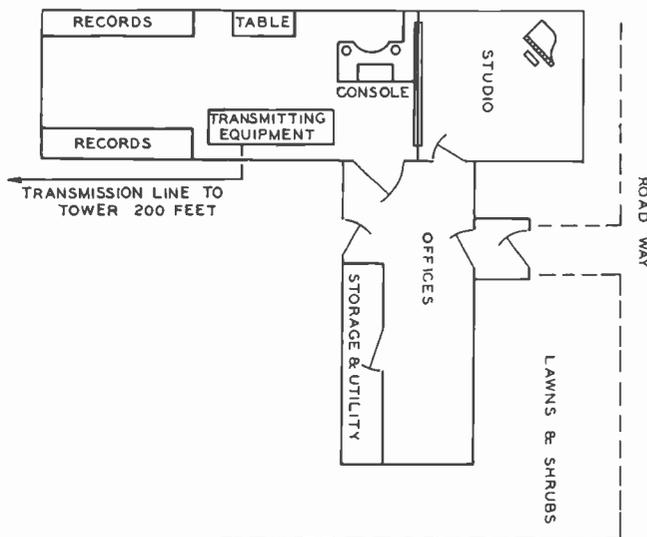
Photo above shows a simple floor plan of Station KXLL. As can be seen in the plan, the operator at the control position has a good view of the studio and other office facilities.
